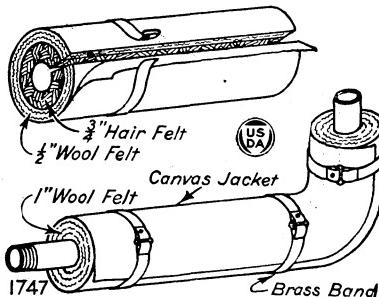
Two pipe coverings for protecting indoor water pipes from frost
